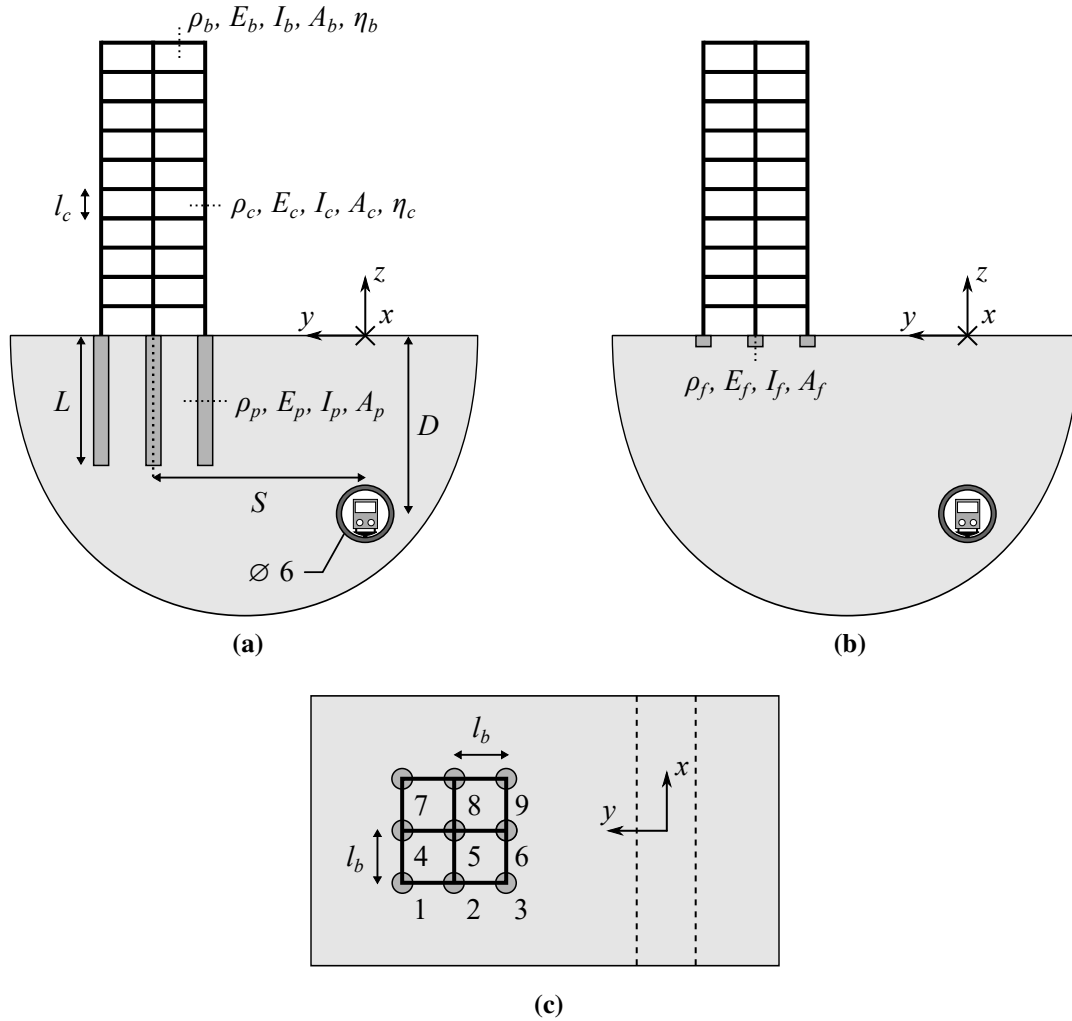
Schematic diagrams of the benchmark building, represented as a 10-storey, 2-by-2-bay frame supported on a foundation of (a) piles and (b) embedded footings, near an underground railway tunnel. (c) Common plan view shows the $N = 9$ coupling points (numbered) at the foundation-building interface and the tunnel's outline below the free surface (dashed lines).
